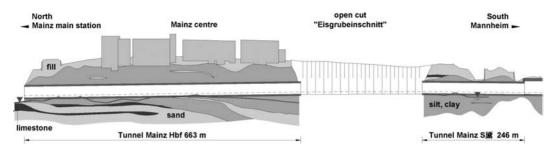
Geotechnical longitudinal section – Old Tunnel Mainz.
